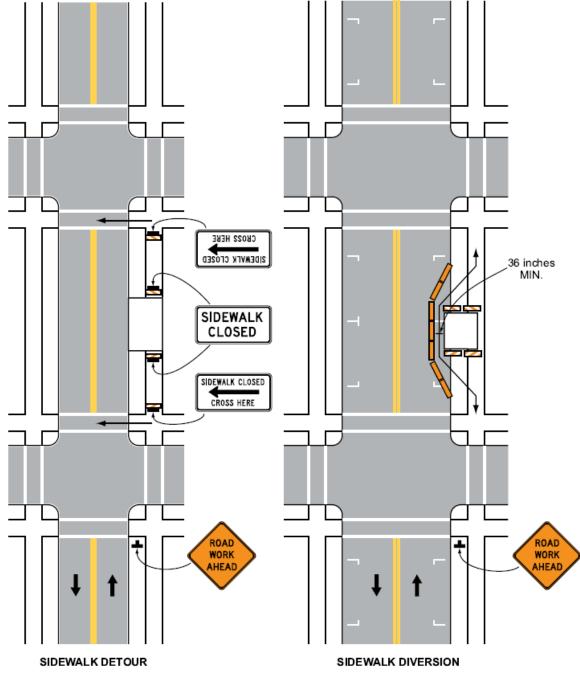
H-28. Sidewalk Detour or Diversion (TA-28)
